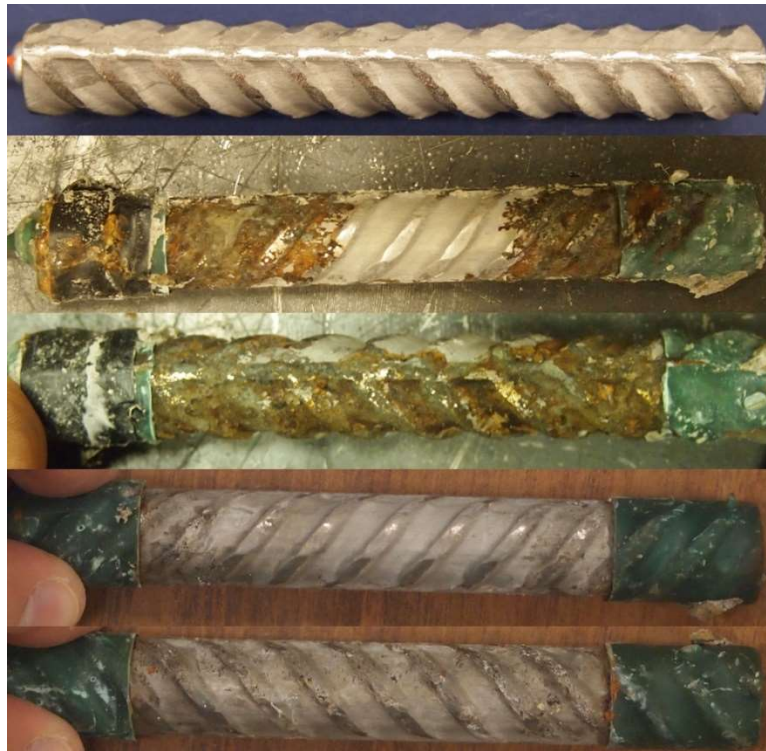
7.5-300 Batch – Corrosion Products on XM-28 AR 6.8. From top to bottom, a) original specimen, b) & c) corrosion products on the specimen upon removal from concrete, and d) & e) pitting corrosion identification on the pickled specimen
